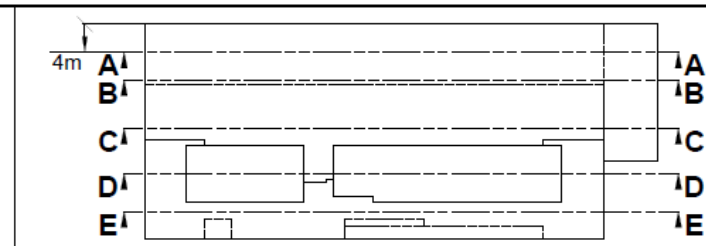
Section view of the tritium plant building at 4 m from the TKB.
